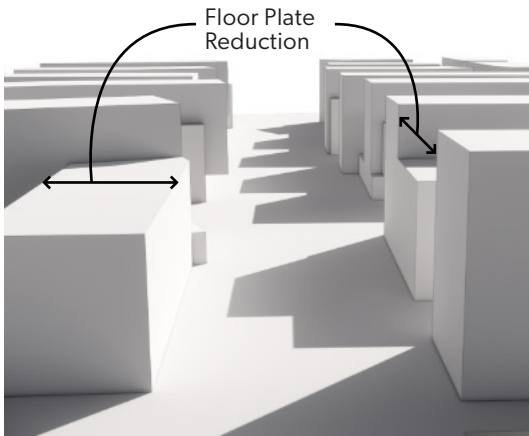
Upper Level Floor Plate Reduction at 164th Street Looking East
